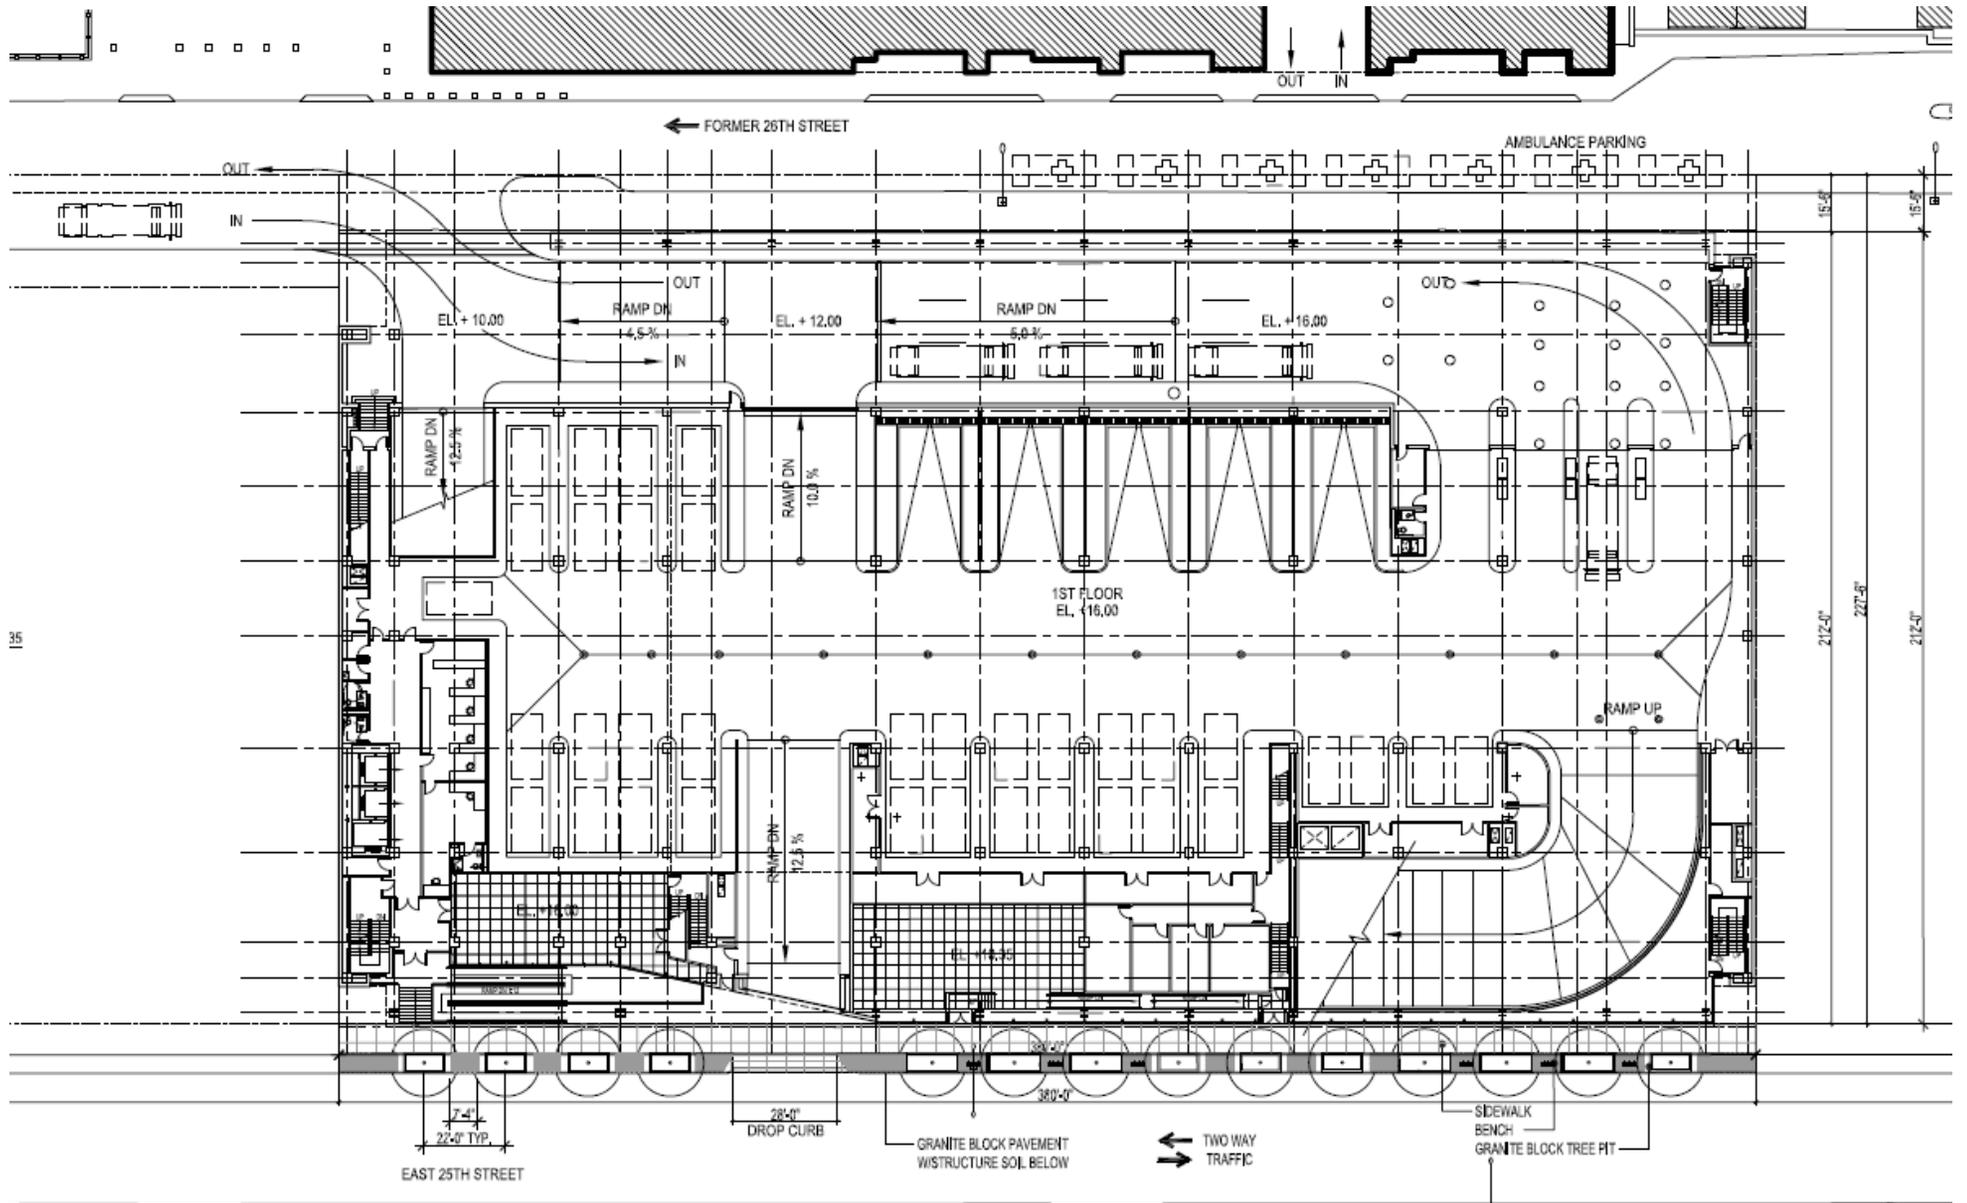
DSNY Garage Complex: Site Plan and First Floor Plan
